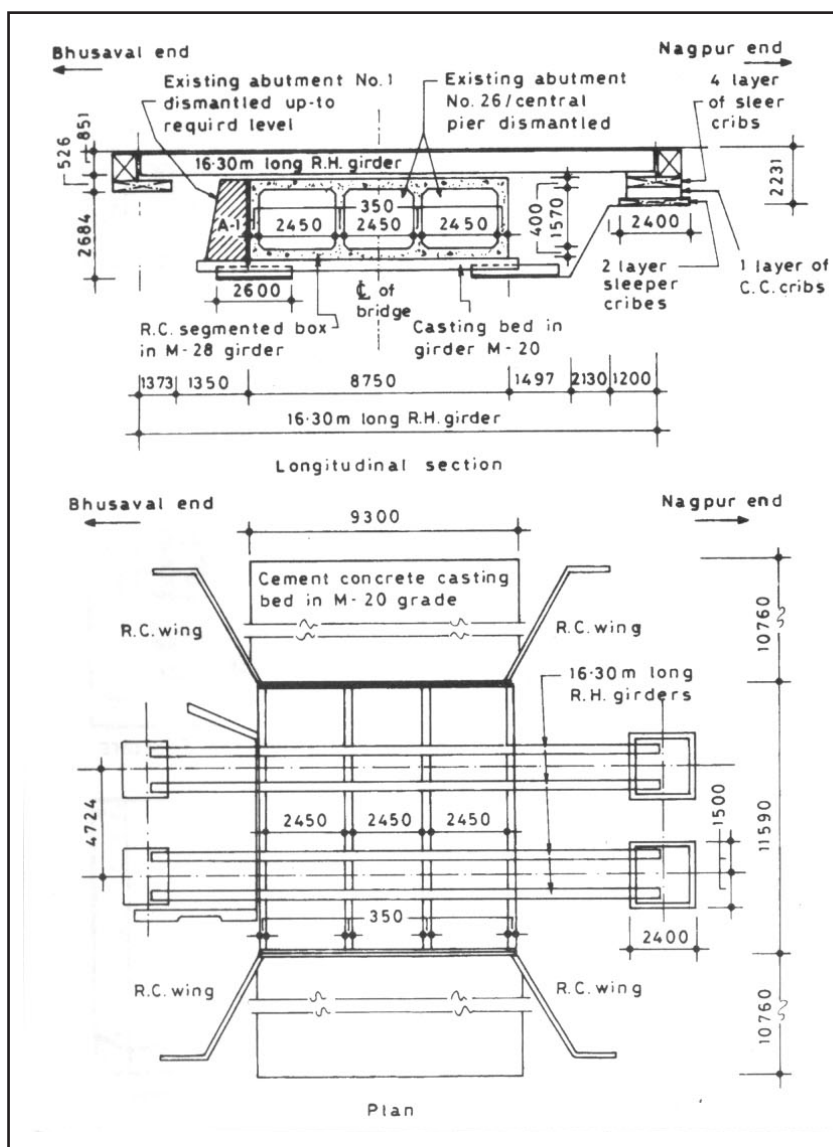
Temporary arrangement for rebuilding of a railway bridge (Case study No. 2)
